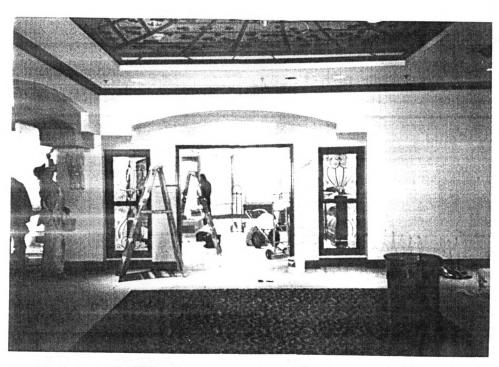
Photograph Number 9:<br/>Photograph Number 10:Front lobby, south wall, first floor, 1997 photo<br/>Front lobby, east wall, first floor elevator, 1997 photo
